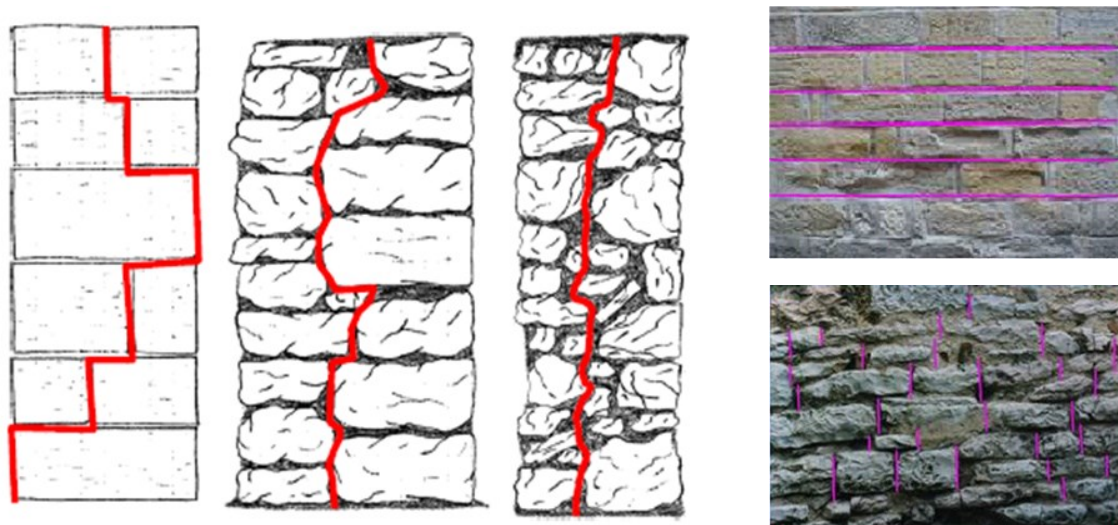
Some parameters counted in the *Masonry Quality Index*: wall leaf connections, horizontality of the bed joint, stagger properties of the vertical joints [50].
